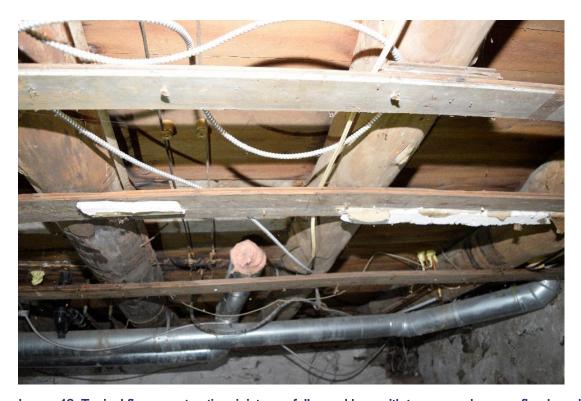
Typical floor construction, joists are full round logs with tongue and groove floorboards
